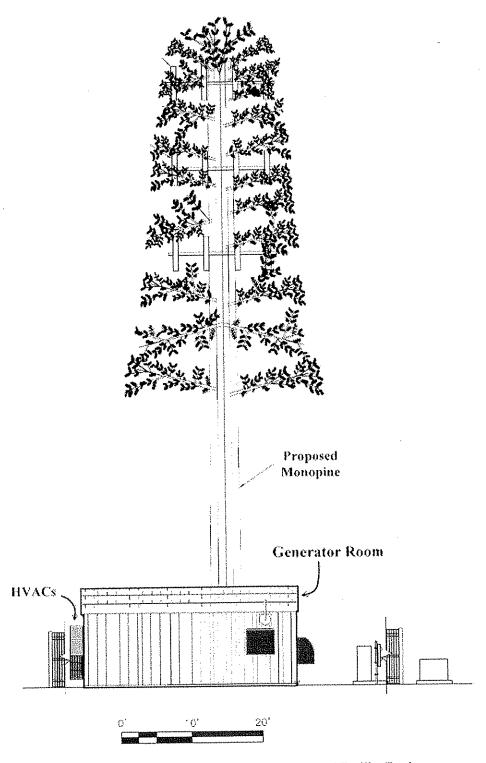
Elevation Plan Showing Monopine Tower and Facility Equipment
